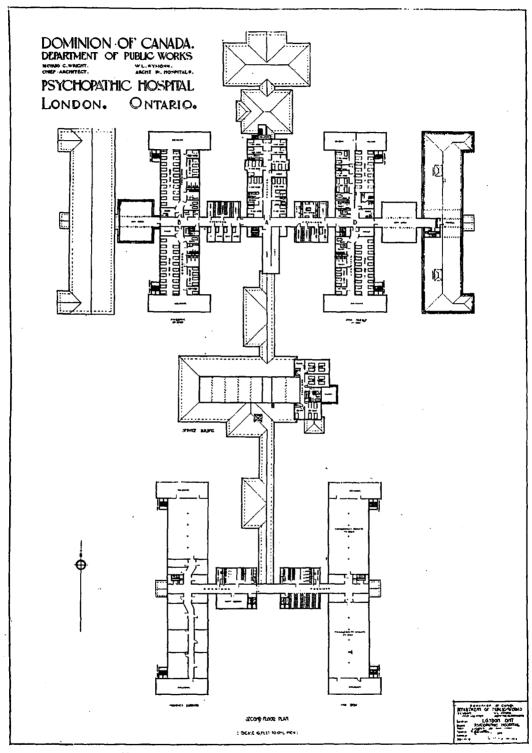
SECOND FLOOR PLAN, PSYCHOPATHIC HOSPITAL, LONDON, ONT.
